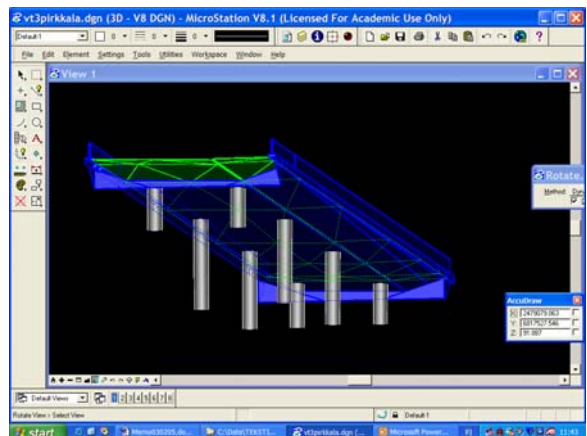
A 3-D Bridge Model (MicroStation, old bridge case to be rebuilt).
